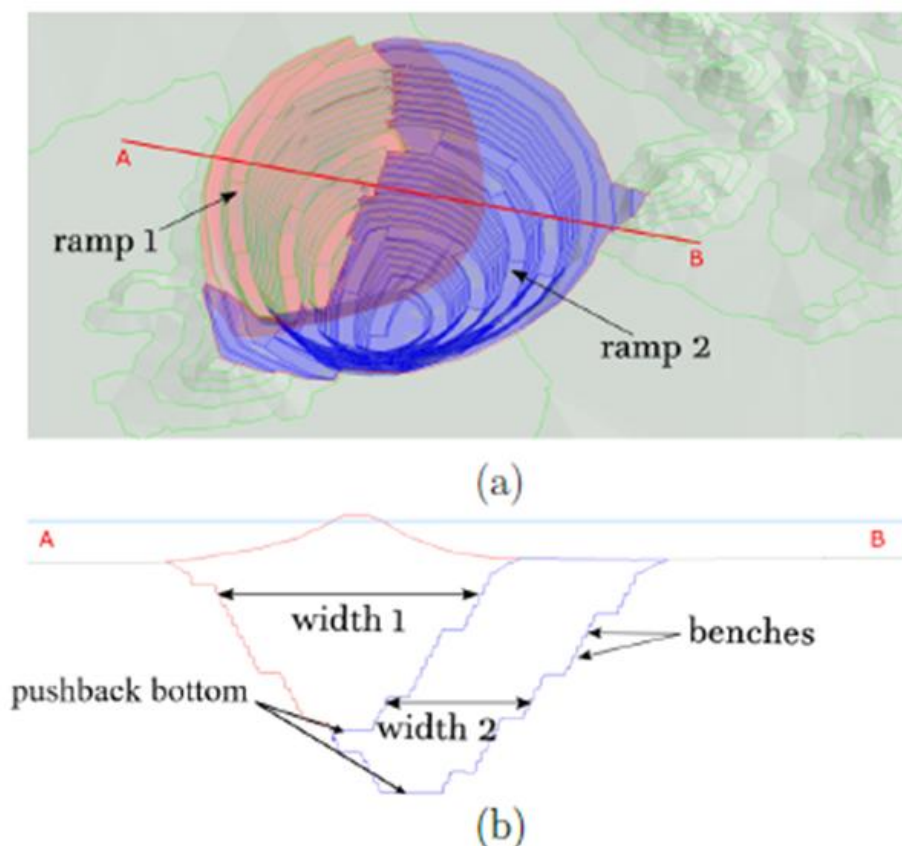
Pushback design example, (a) isometric view (b) cross-section
